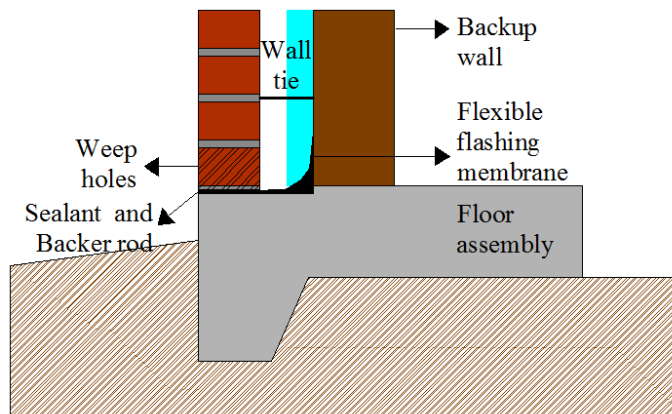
Generic scheme of water proofing configuration adopted for masonry veneer walls [26, 31]
